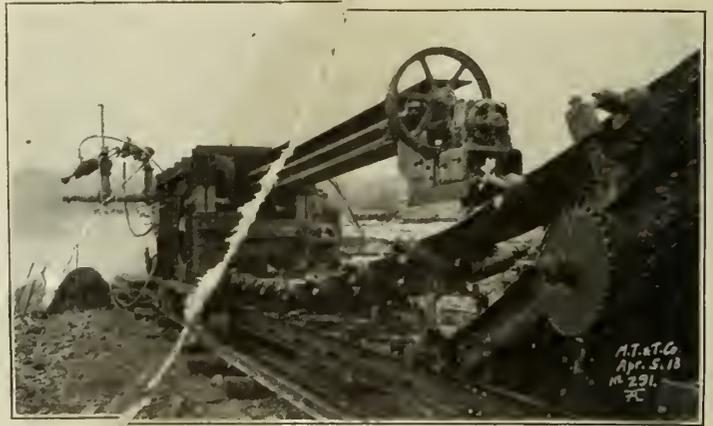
Rear View of Muck-Handling Drill Carriage.
